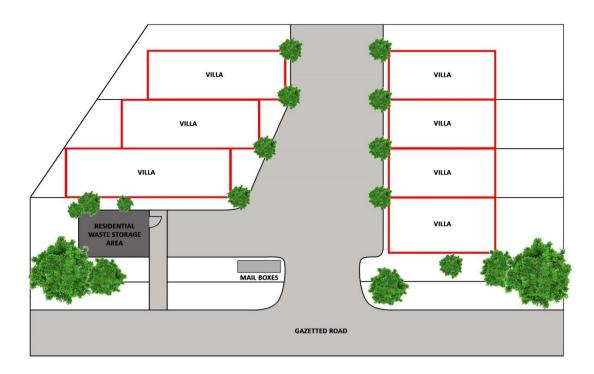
Example of a kerbside (on-street) Waste Collection Area
